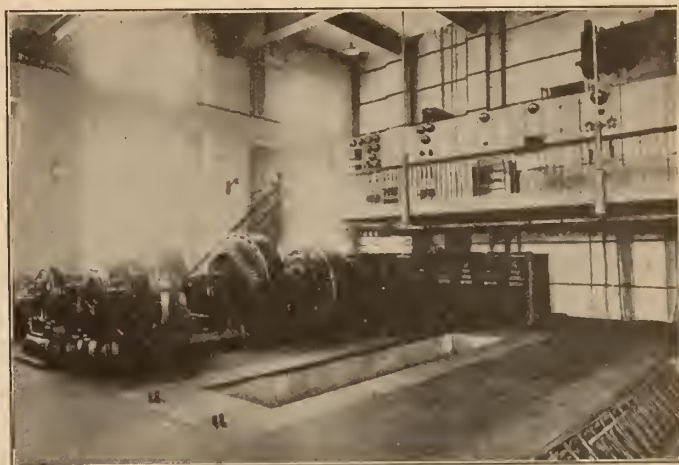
,—View of Electric Railway Power House taken during installation, showing one Generator Set Mounted—
